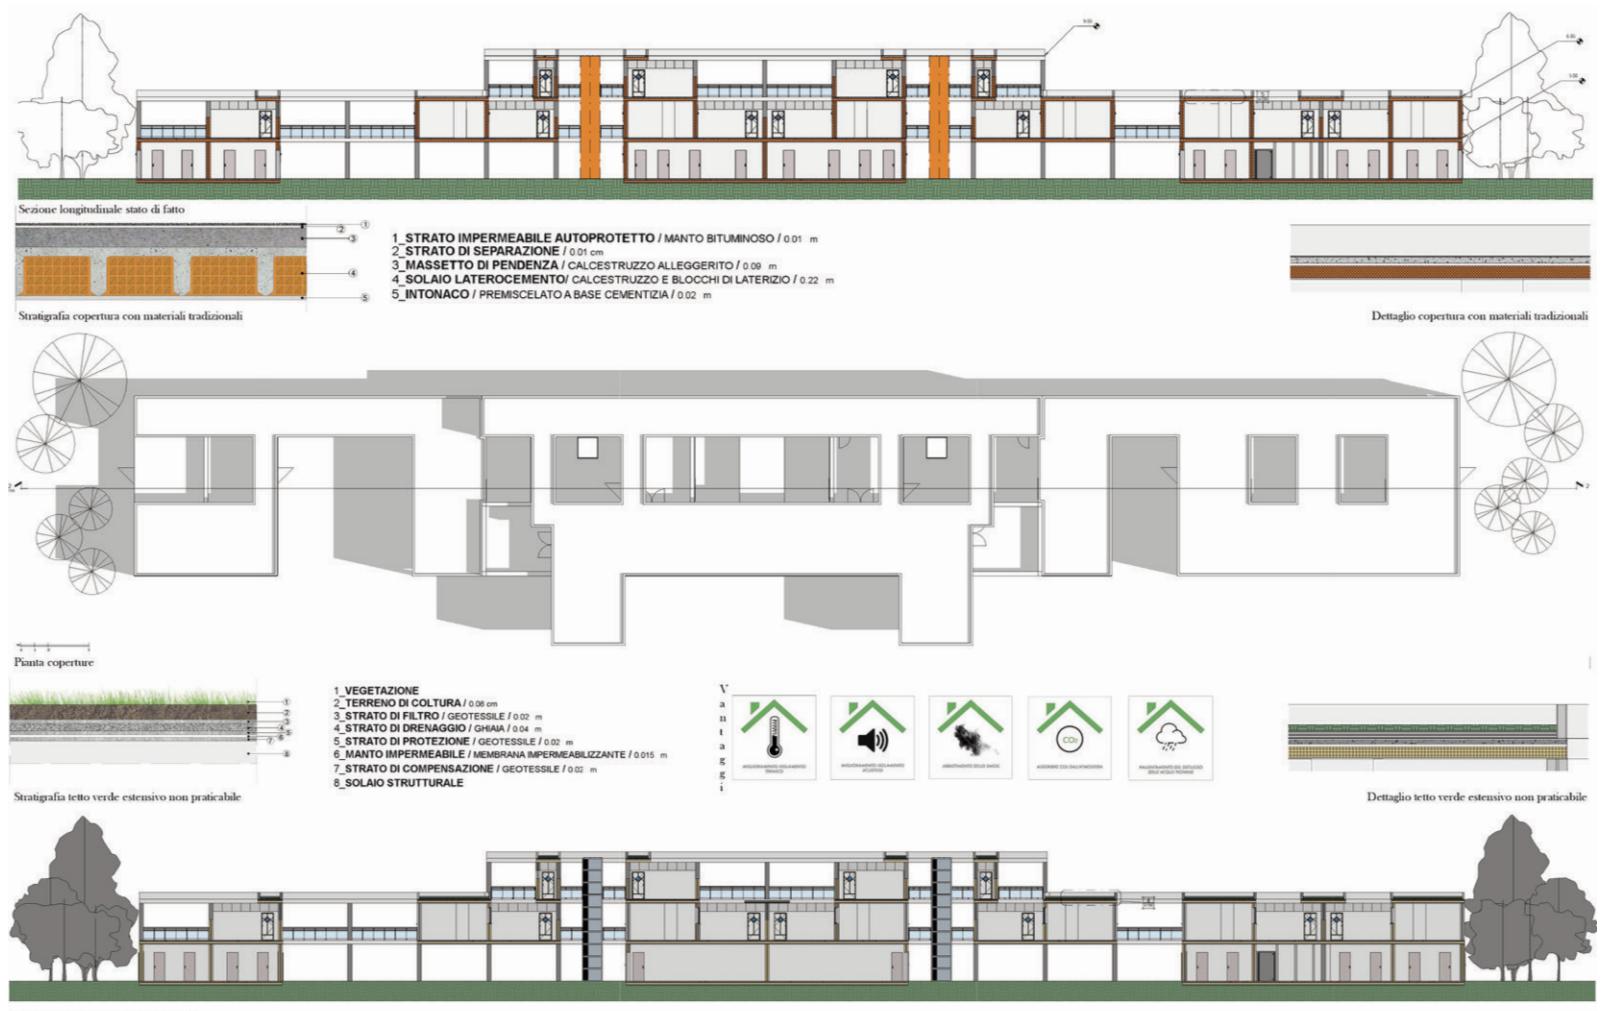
Roof plan and vertical sections: comparison between traditional and innovative materials from BIM platform (credit: R. Russo).
